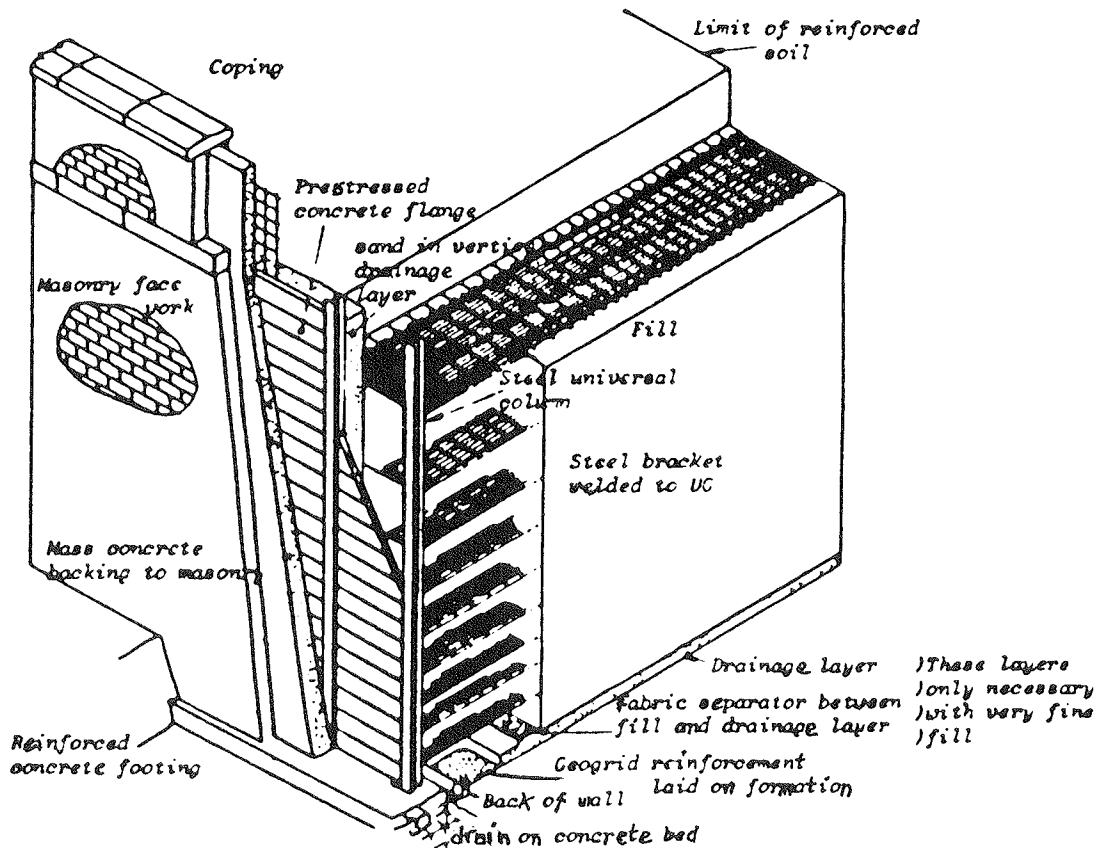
Reinforced soil arrangement similar to the trial wall at Dewsbury, Yorkshire, U.K. [Jones, 1984]
